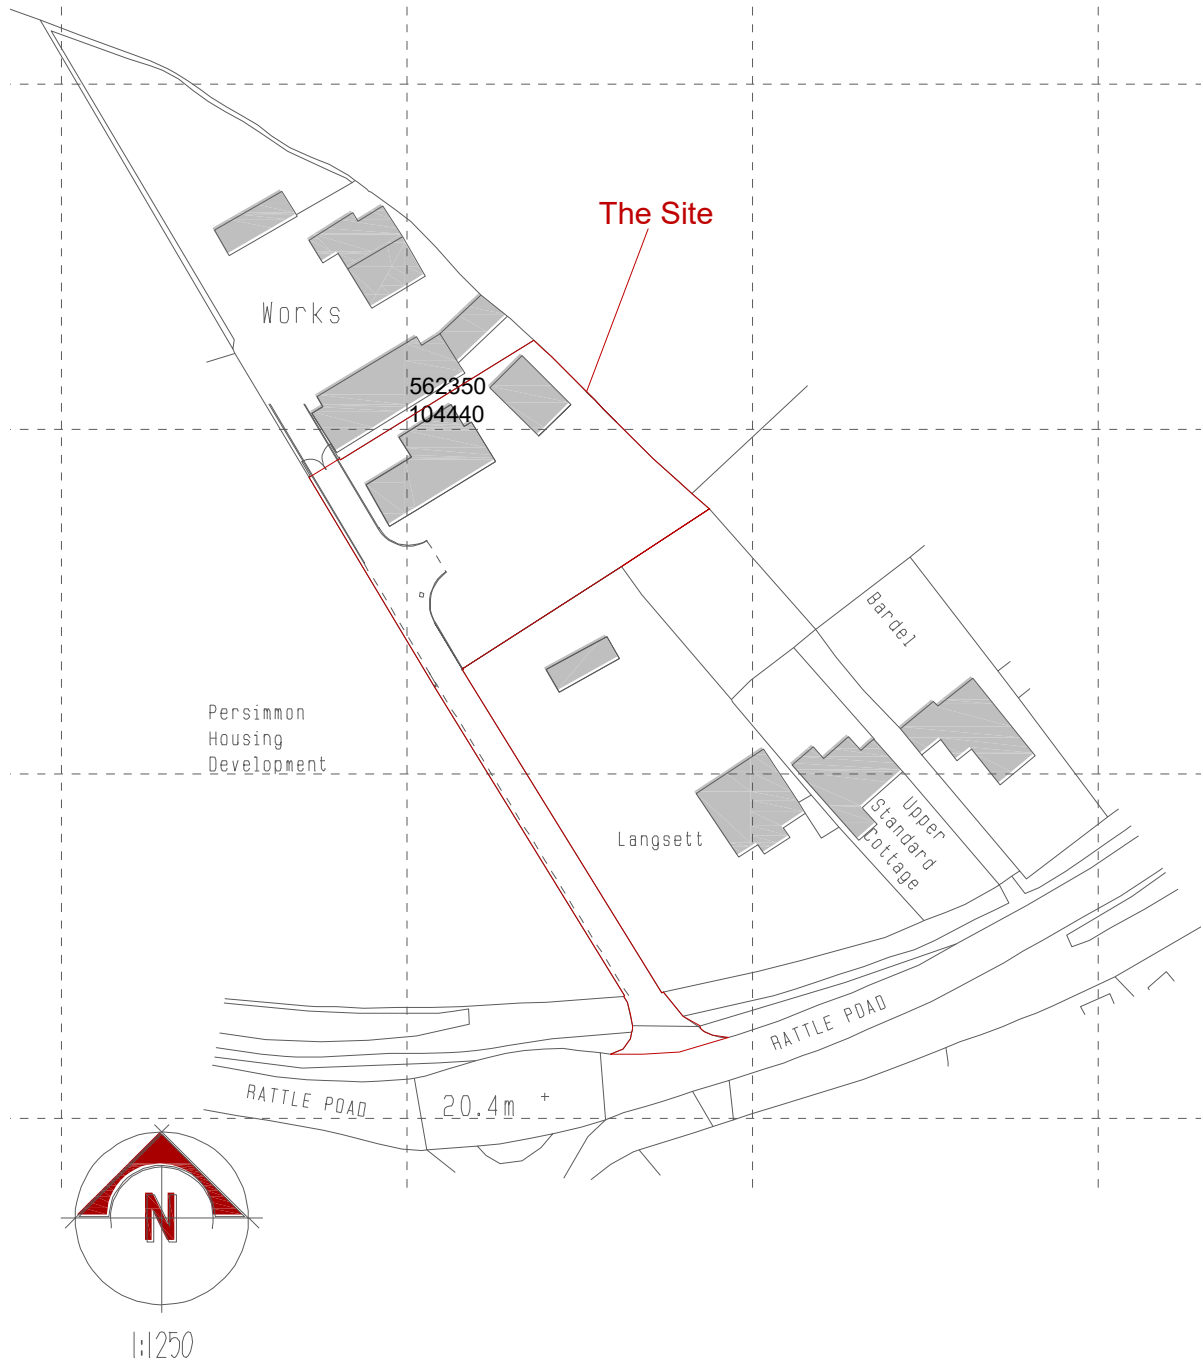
Lower Yard, Langsett, Westham: Existing Site Plan
